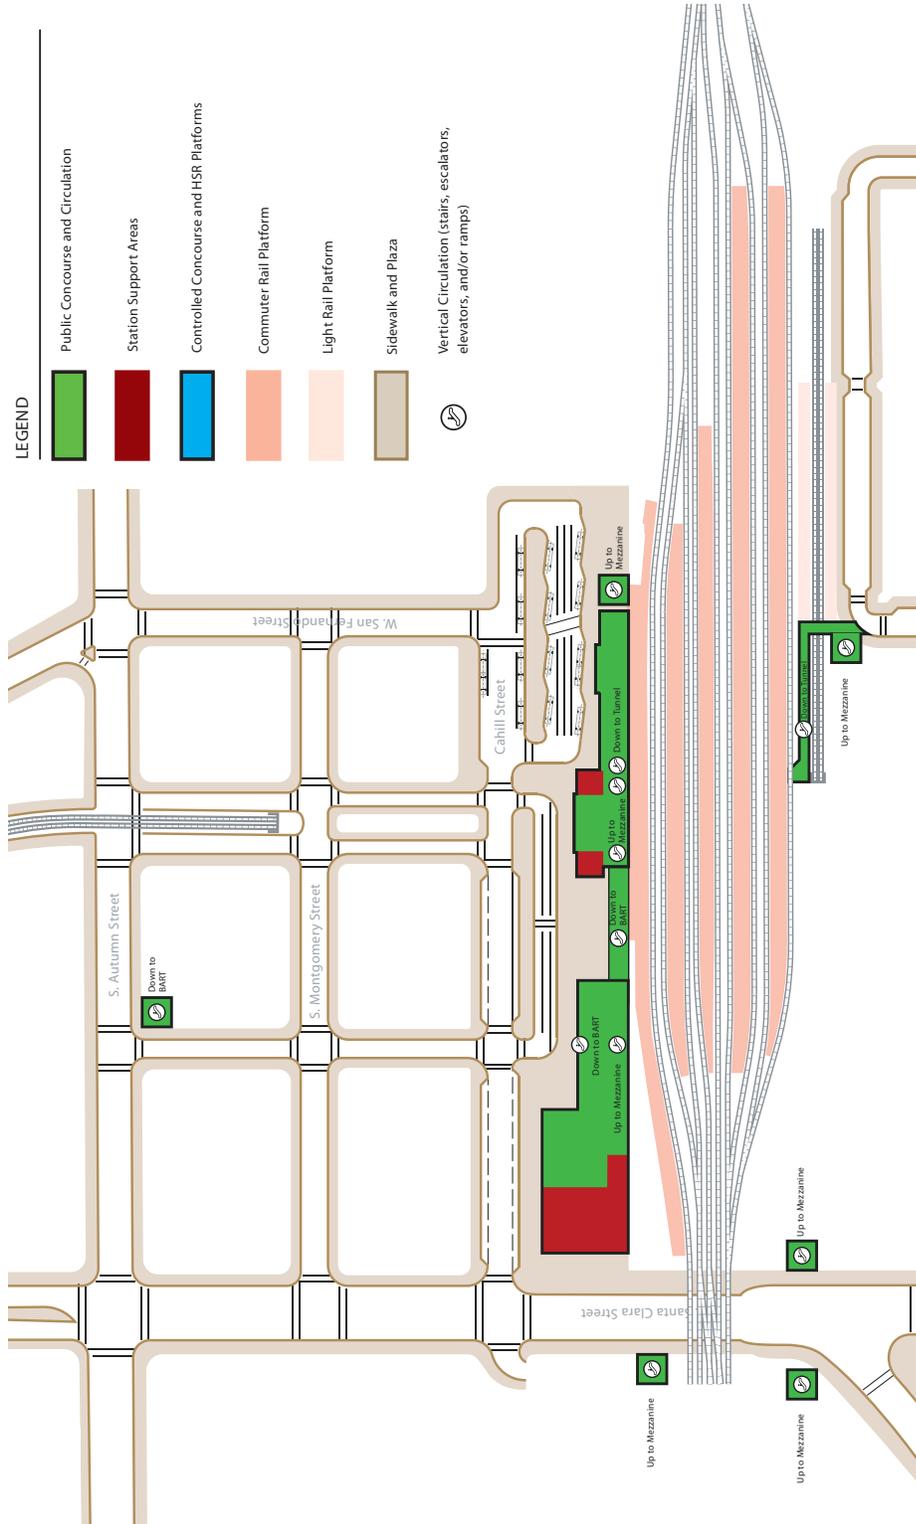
STATION STREET LEVEL ALTERNATIVE PLAN
